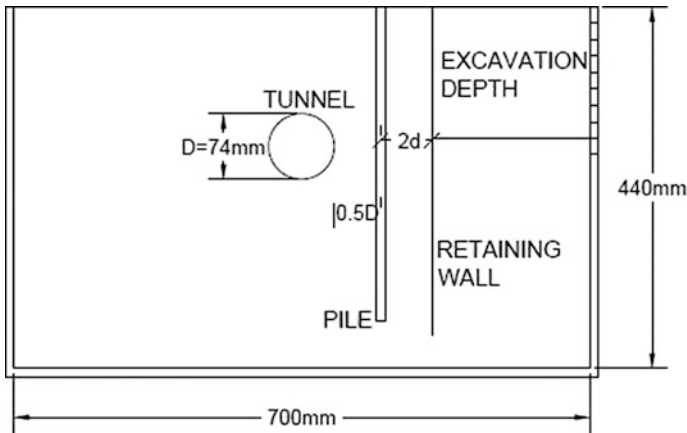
Schematic arrangement of test setup for excavation and tunneling
